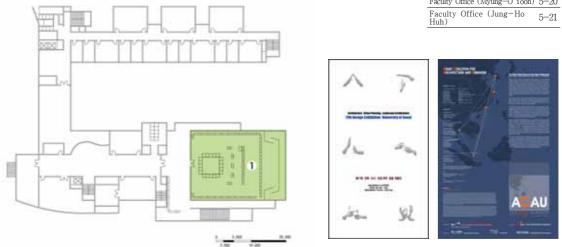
The 21st Century Building Key Plan: Exhibition Room and ACAU Posters
